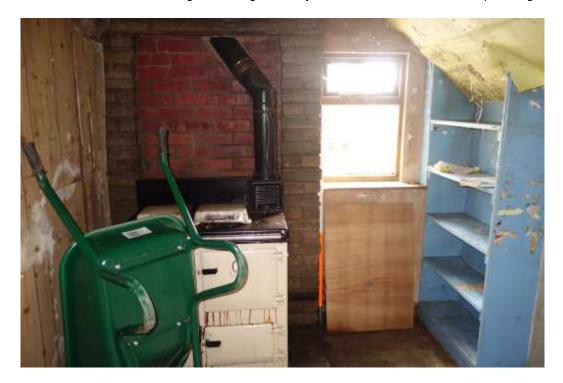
Internal view of kitchen looking E showing renewed brickwork in E wall to left of window
